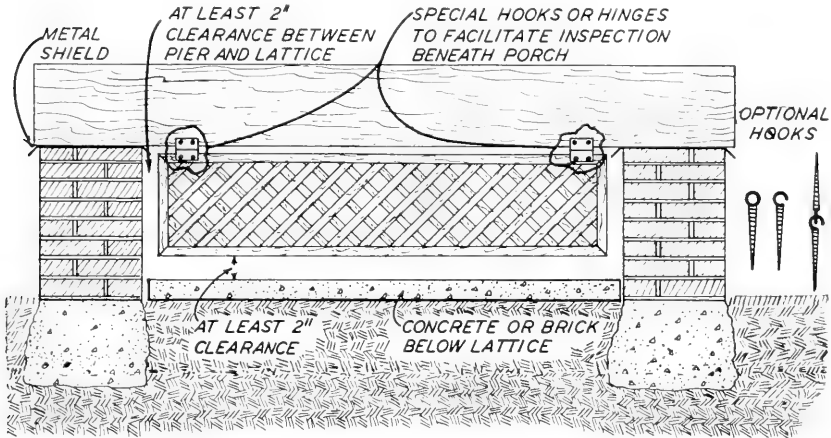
Recommended method of attaching porch lattice, which should hang on hinges to facilitate frequent inspection. Optional hooks shown may be used to allow easy removal of lattice. A clearance of at least two inches at sides and bottom is provided to prevent possible entry of termites from soil or piers.
